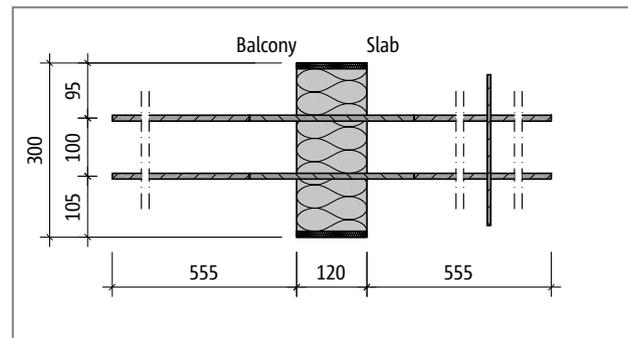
Schöck Isokorb® XT type Q-PZ-V1: Product plan view
